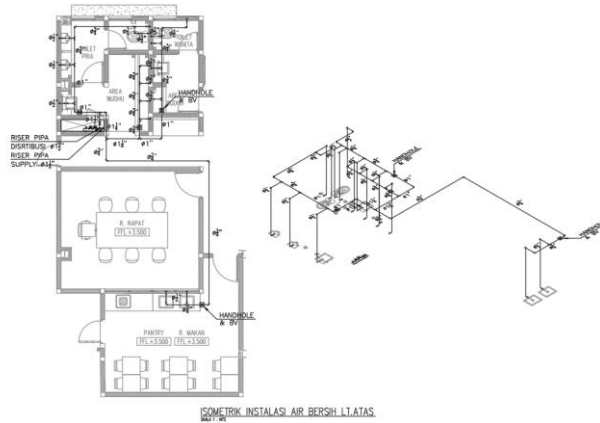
Second Floor Clean Water Pipe Line Installation Plan
